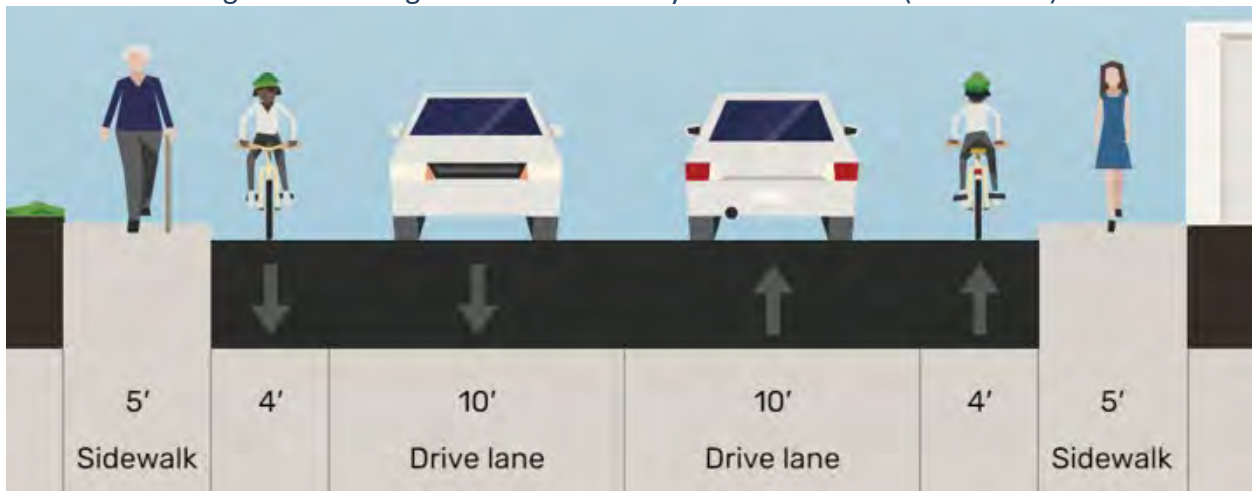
Existing Section – Monterey Ave to Park Ave (38-ft ROW)
